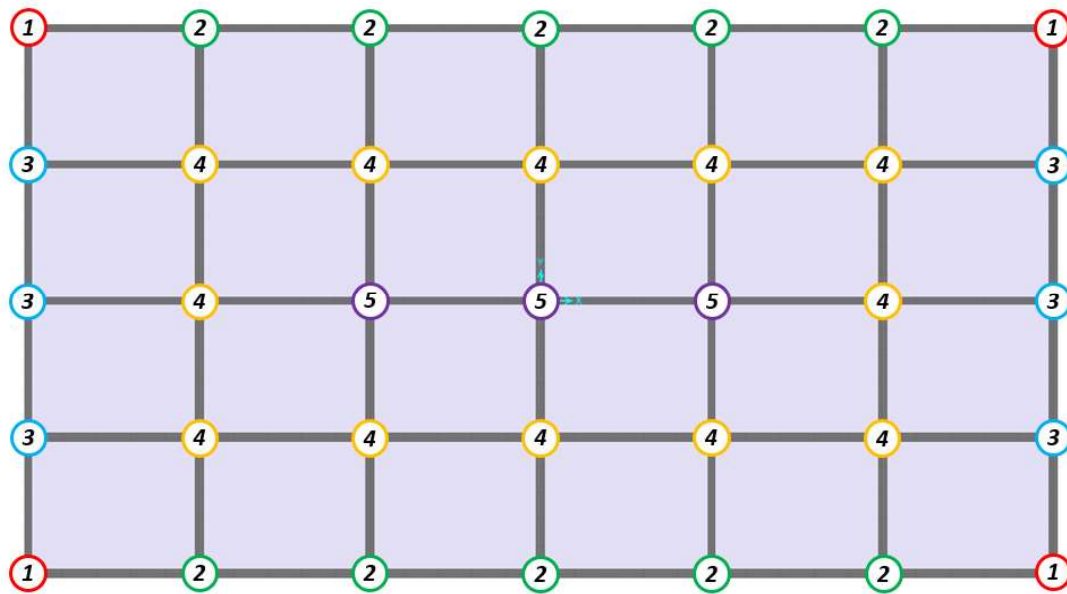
Column grouping of the 10-story steel structure with 1026 members.
